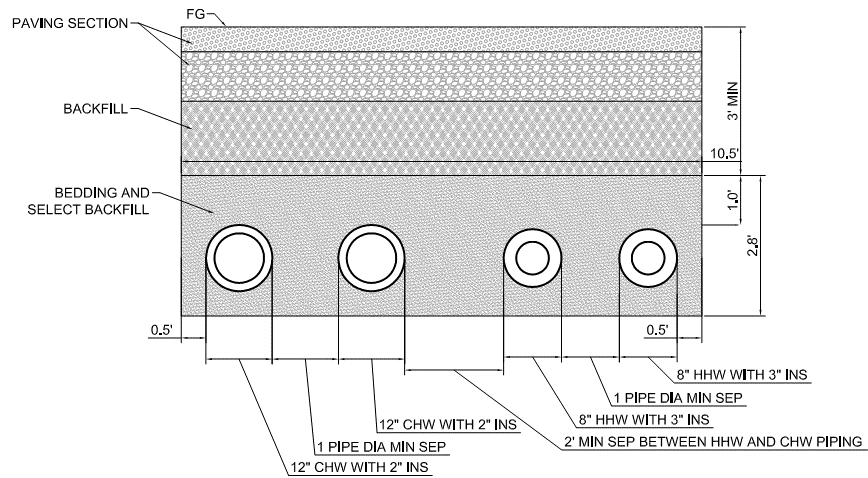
Chilled and Hot Water Combined Trench - Maximum Section
